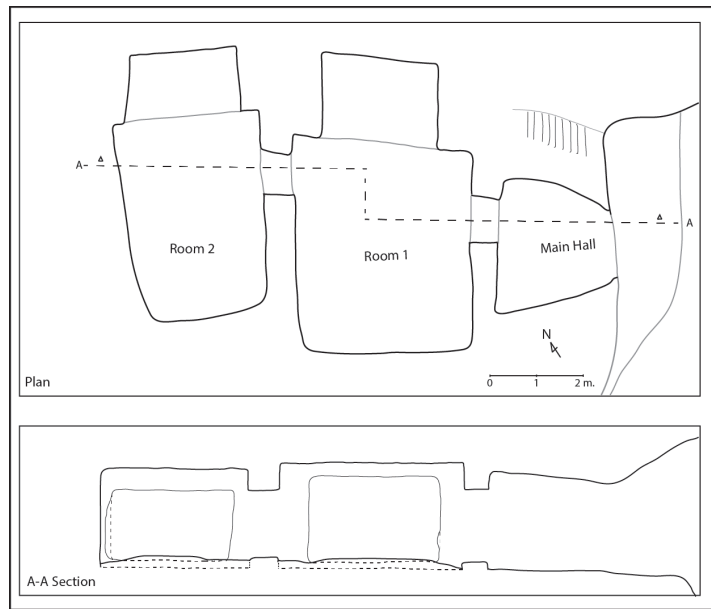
Plan and section of the Anbar rock-cut tomb.
